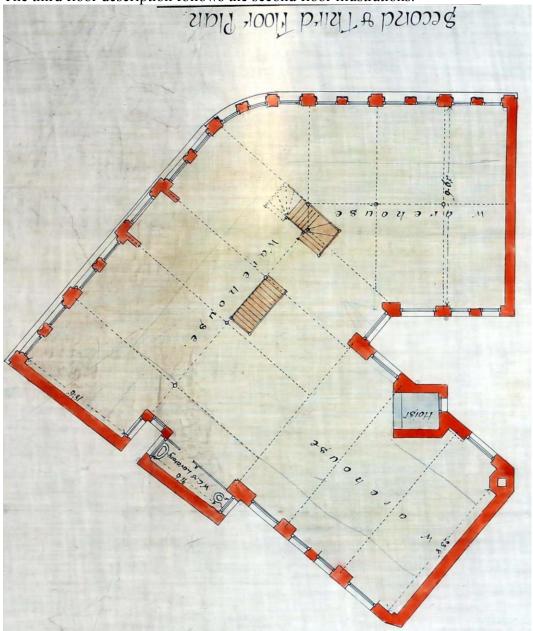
Detail of second and third combined floor plan from the 1897 proposals ROLLR 1897/4848. North approximately to top of page
